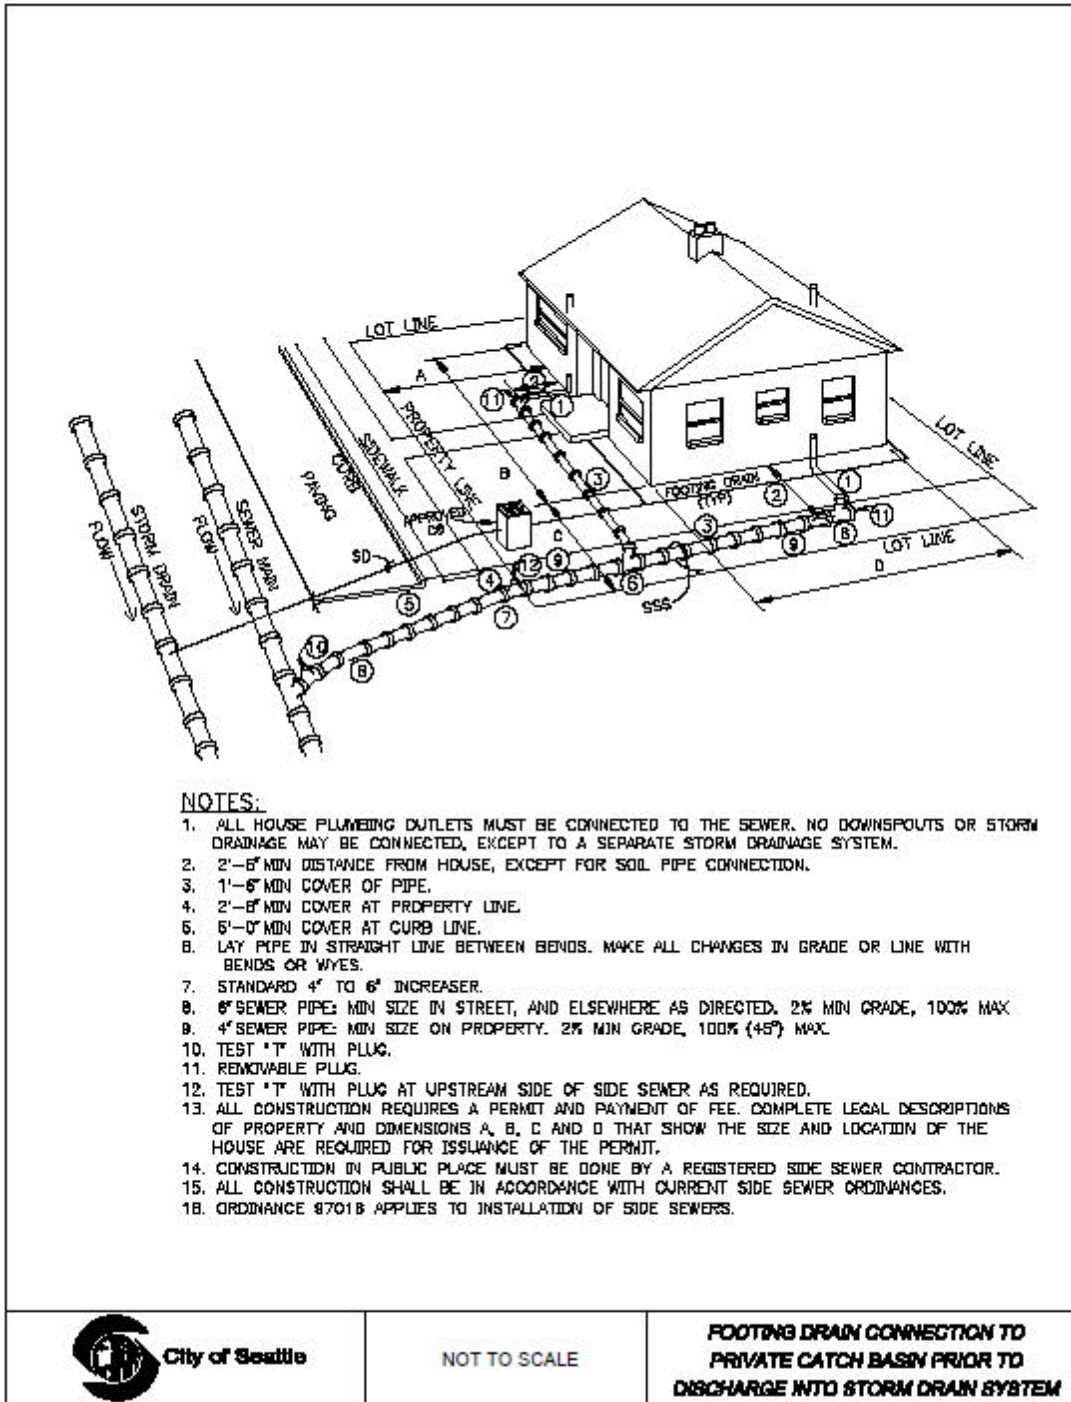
Side Sewer & Service Drain Connection To A Separated System
